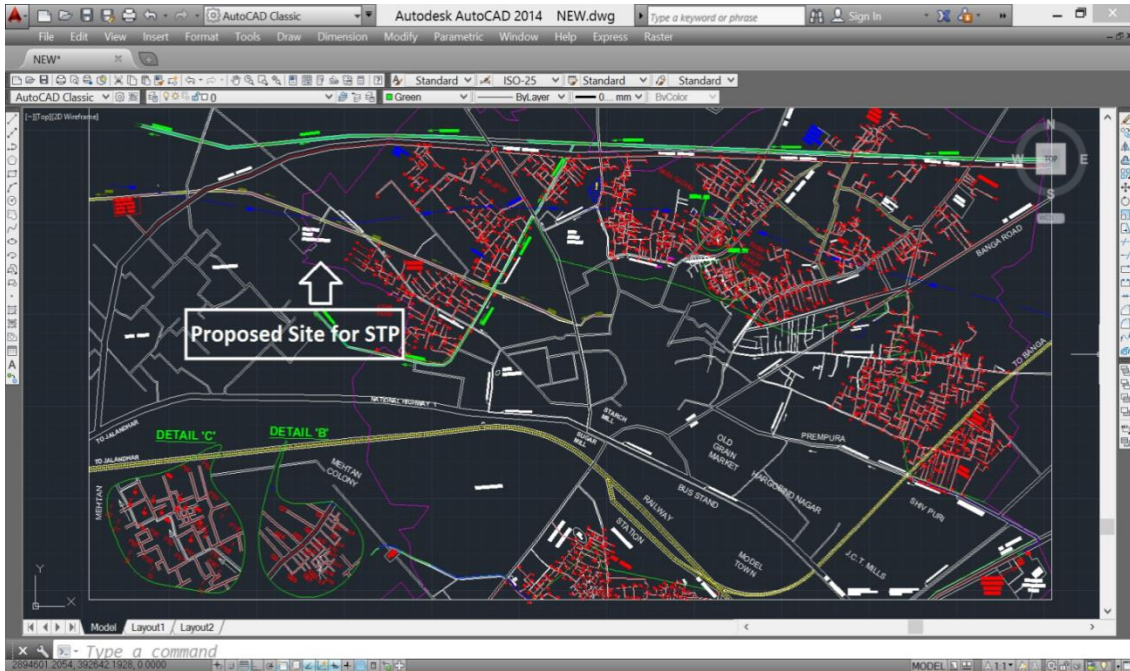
AutoCAD drawing for laying of proposed sewer
